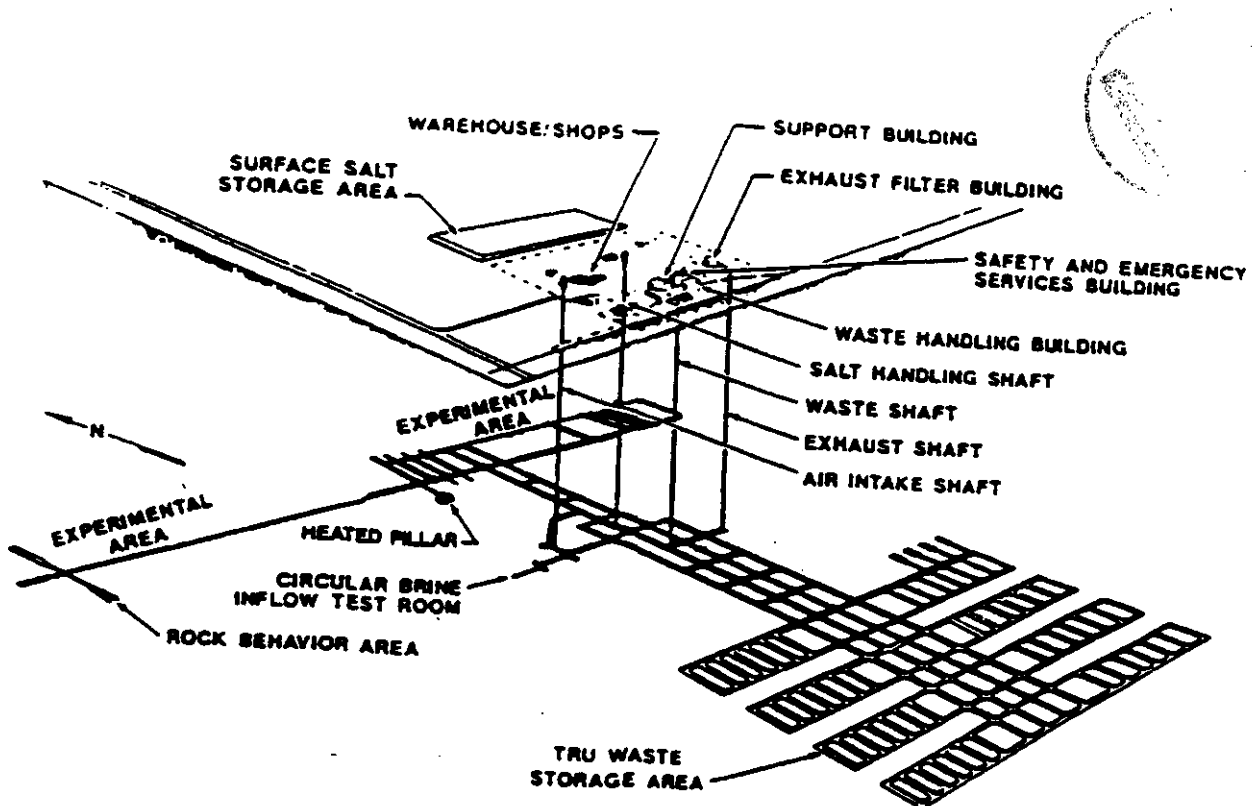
Plan View of WIPP Completed and Proposed Excavations.
